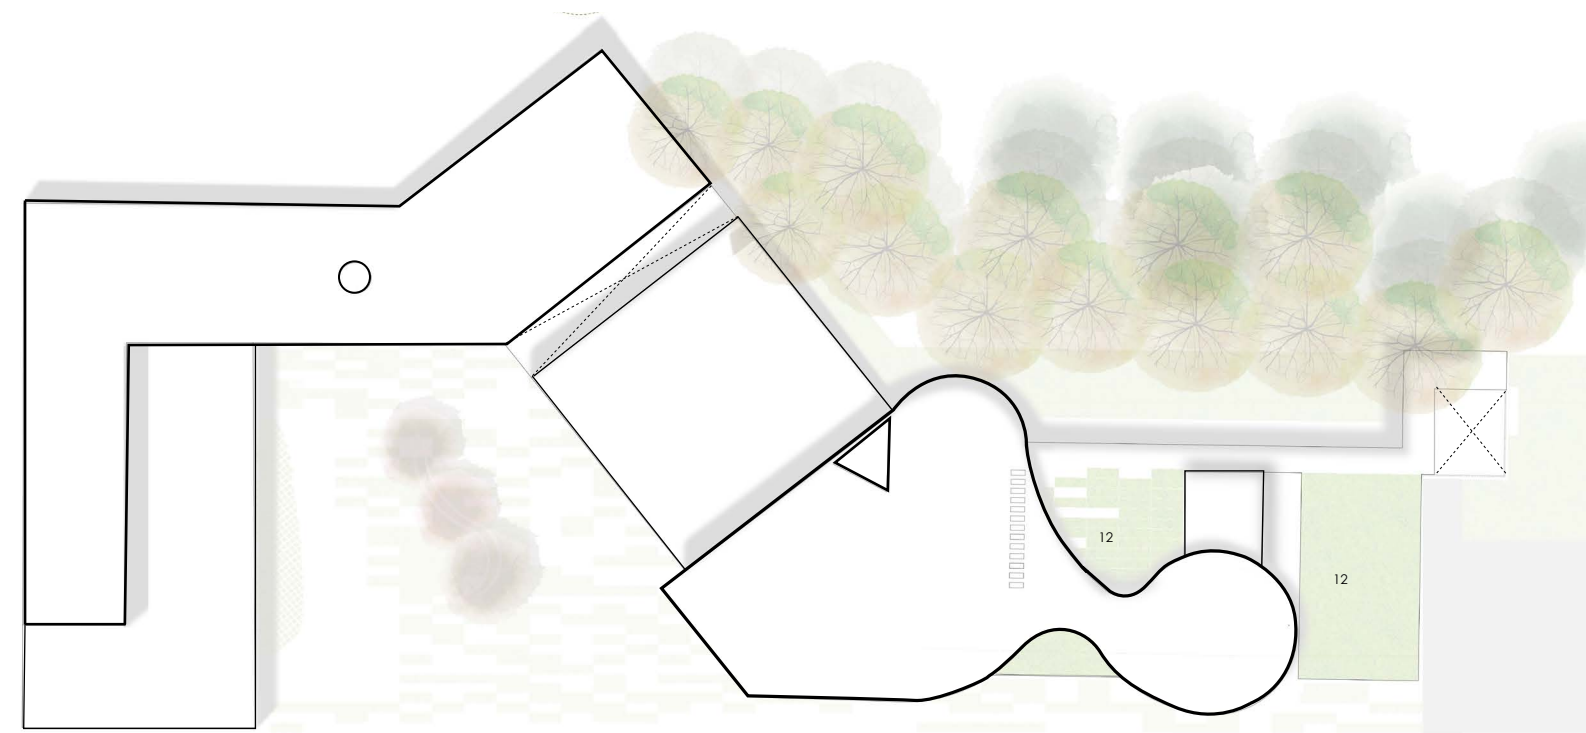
Fourth Floor Plan, Community Center and Residential Building
